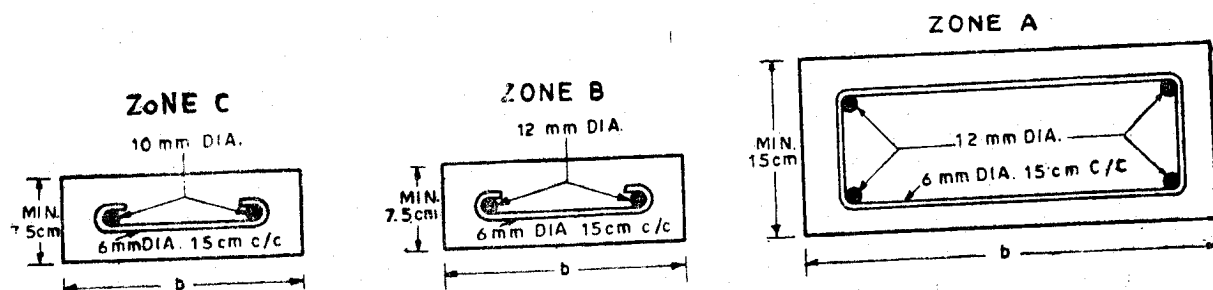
CROSS SECTIONS OF REINFORCED CONCRETE LINTEL BANDS
